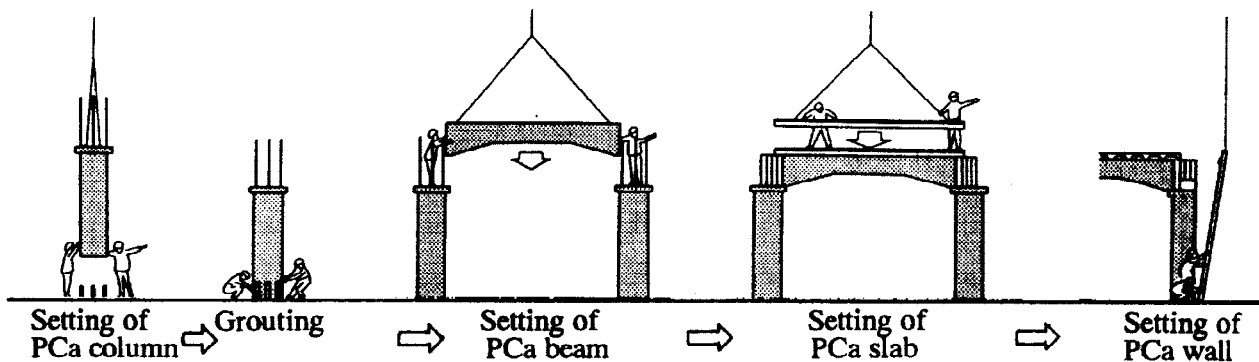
Typical construction procedure by the precast reinforced concrete frame systems
